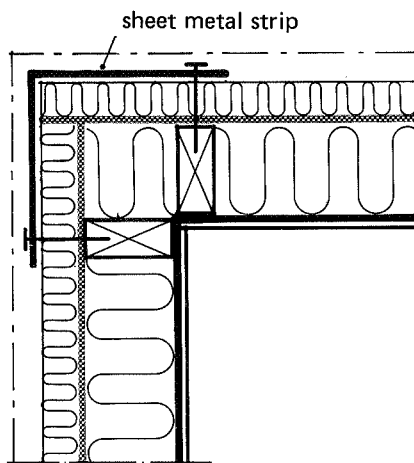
shows the different alternatives for anchoring corner members using as little timber as possible. The method selected depends on the loading, the form of construction, the working method, adaptability to plan dimensions etc.
